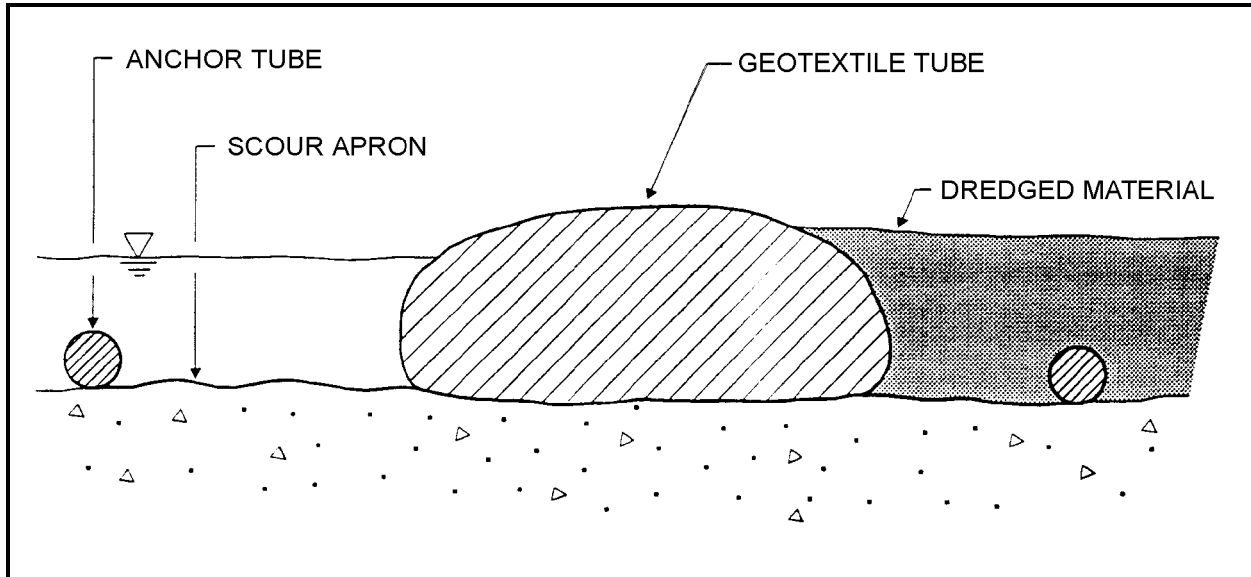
Schematic cross-sectional view of a geotextile tube retaining and protecting dredged material
